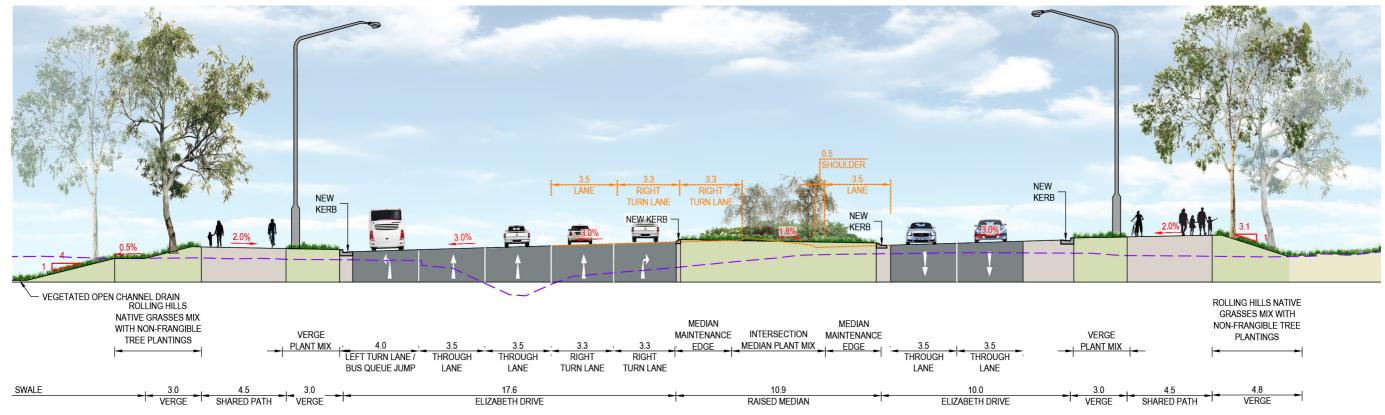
Section 02 - Typical Typology 'Rolling Hills' (Approx. CH 1660)
